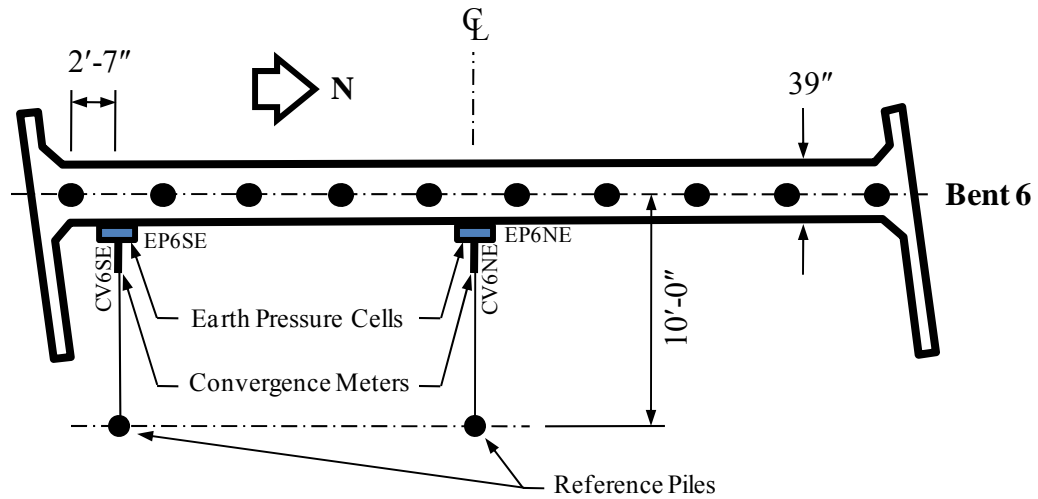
SR18 East Abutment Instrumentation (Plan View)
